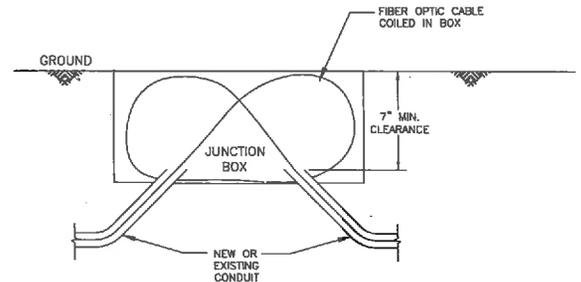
FIBER SPLICE ENCLOSURE AND CABLE STORAGE DETAIL
